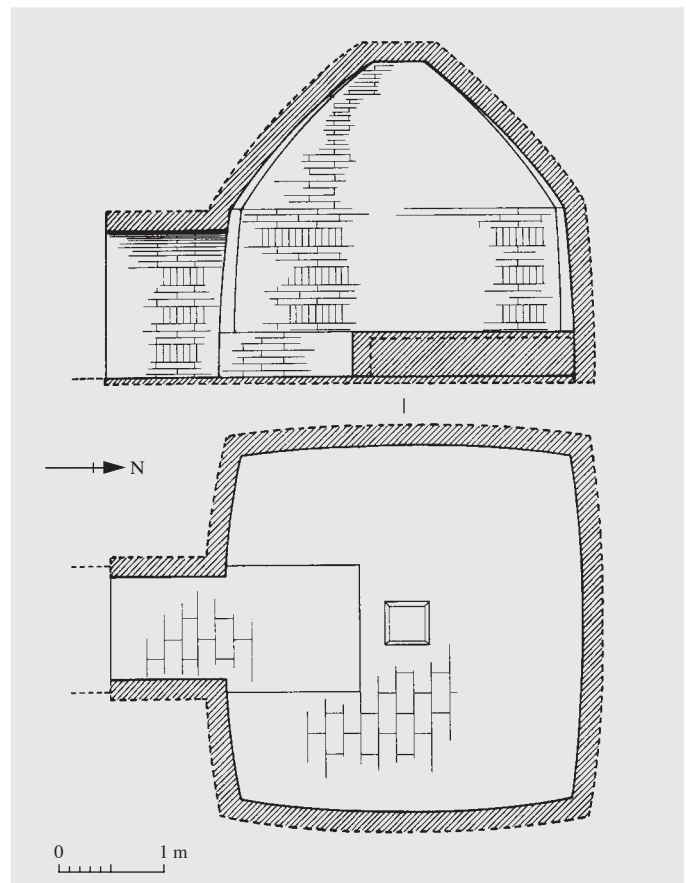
Plan and cross-section of the tomb of Hao Kuan
